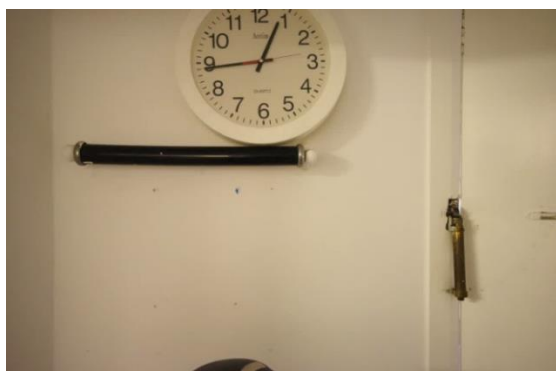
Room 3: Staff room (former men's toilets) showing c1951 towel rail and fire door mechanism on west wall.
